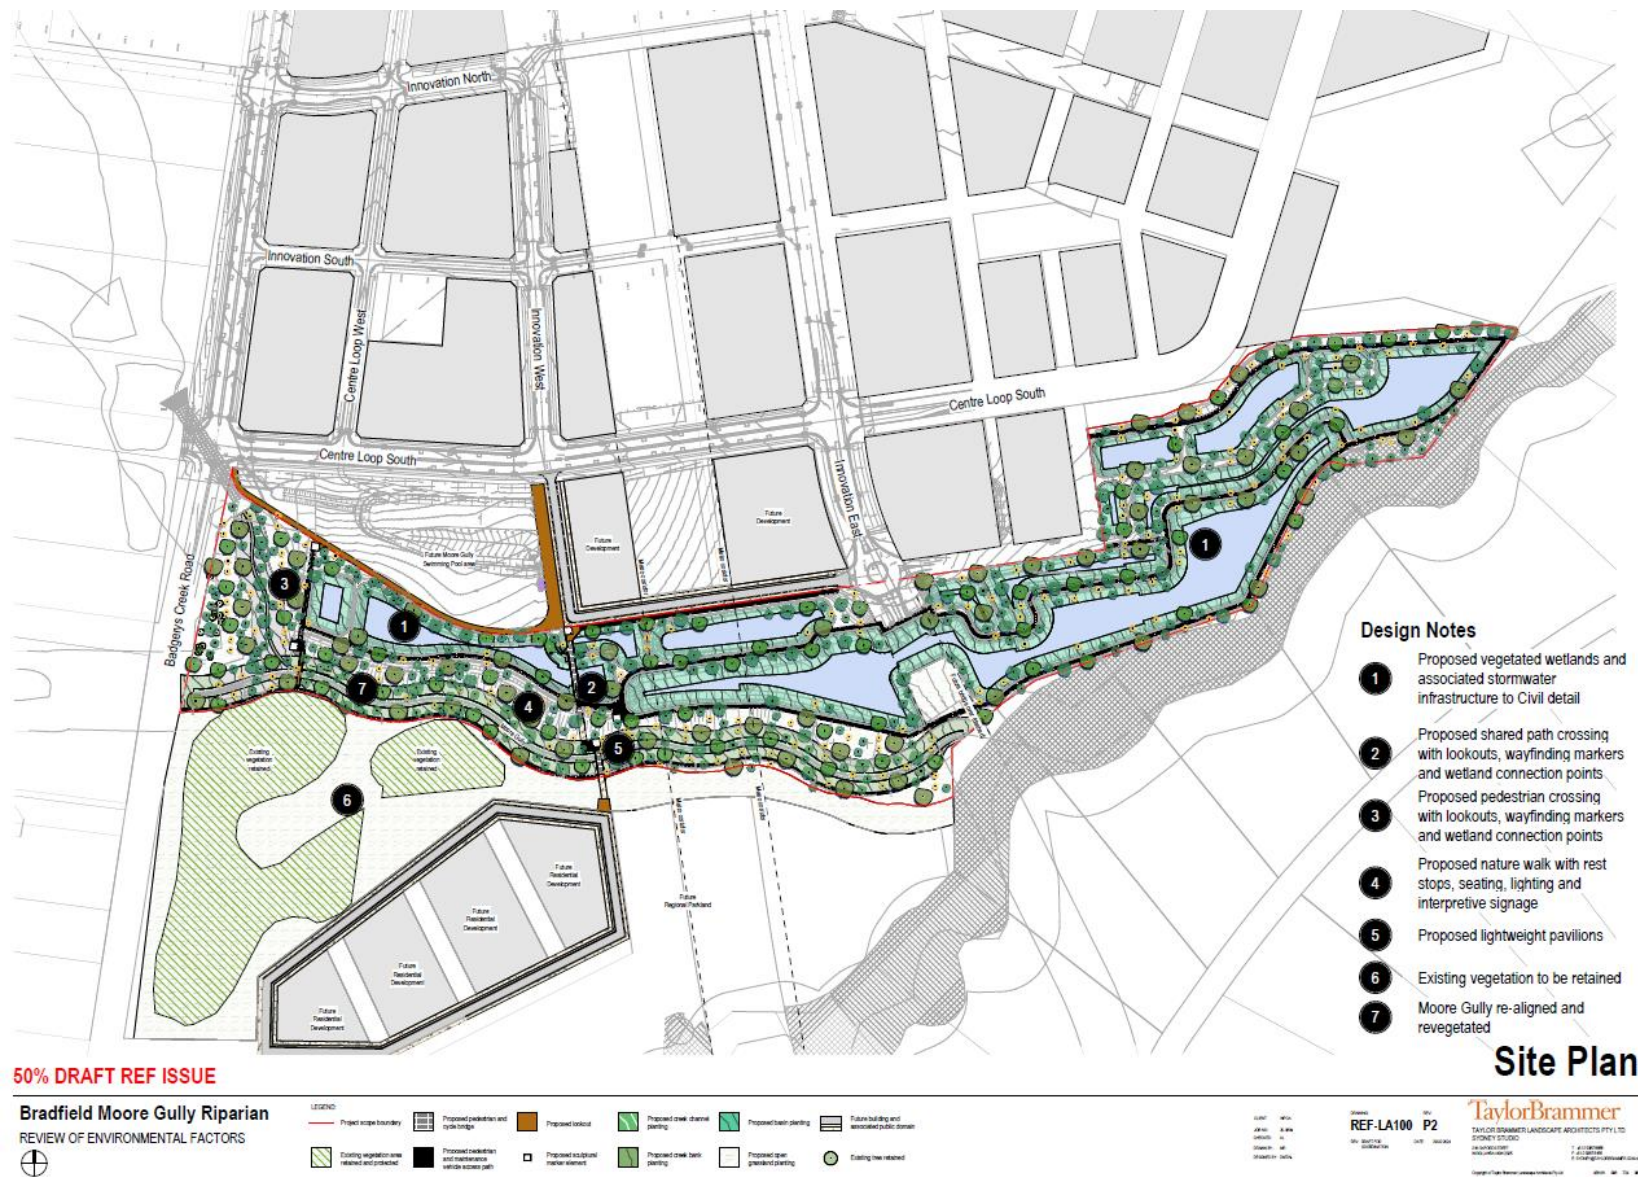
Bradfield Moore Gully Riparian Detailed Planting Plan (Taylor Brammer, 2024)
